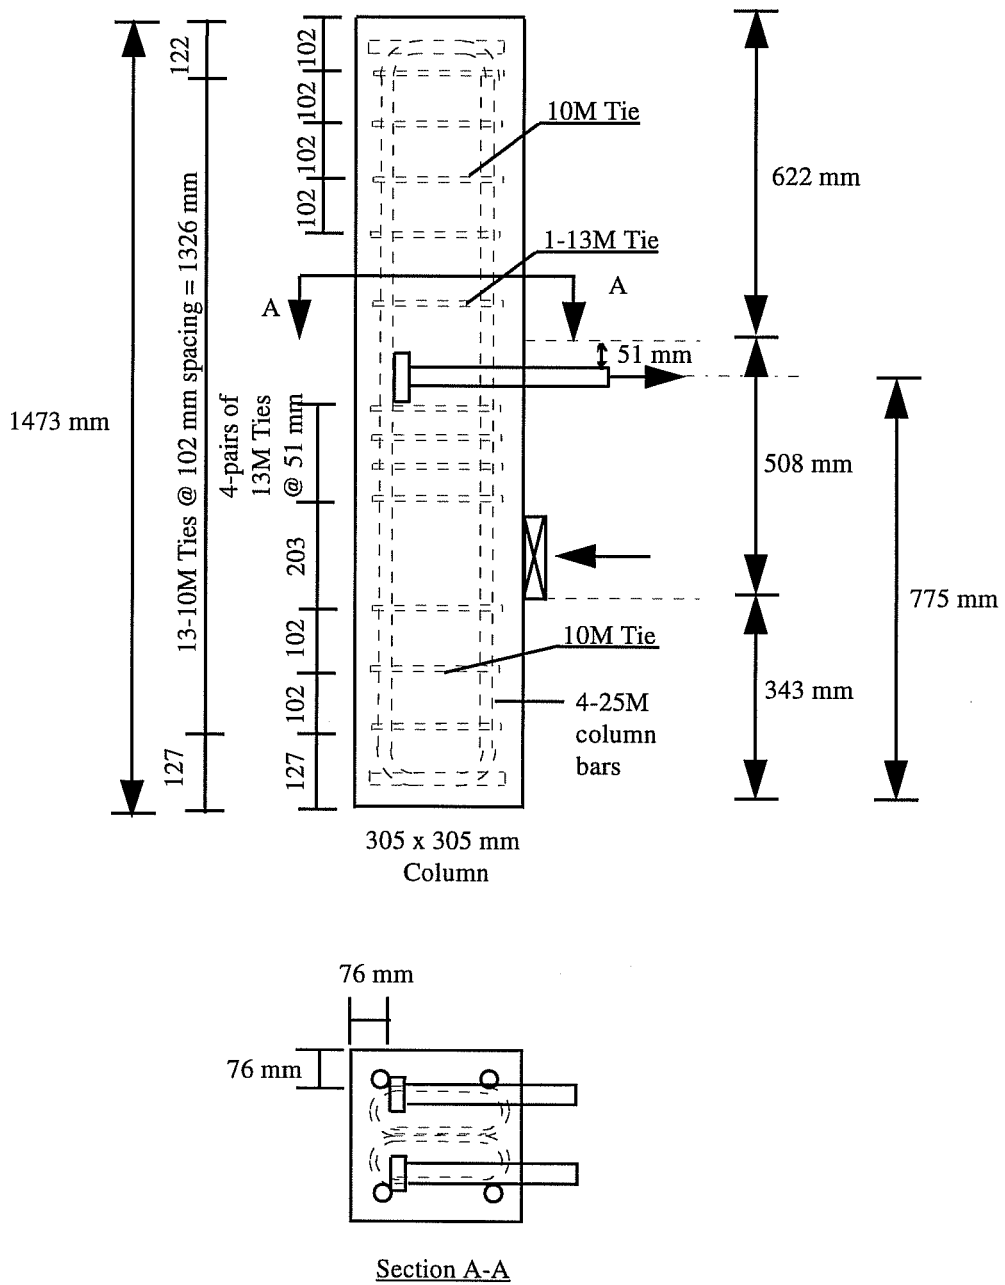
Reinforcement details - Specimens T21, T22, T27, 31, and T32
